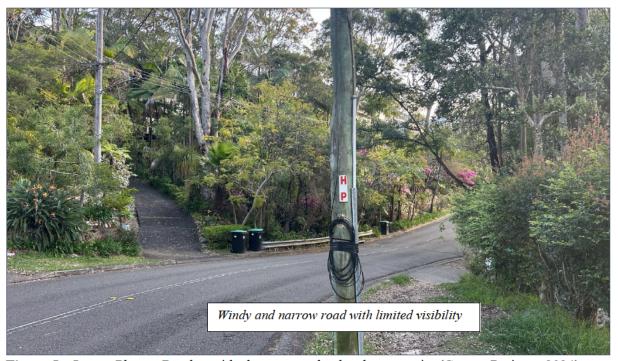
Lower Plateau Road outside the entry to the development site (Corona Projects, 2024)
